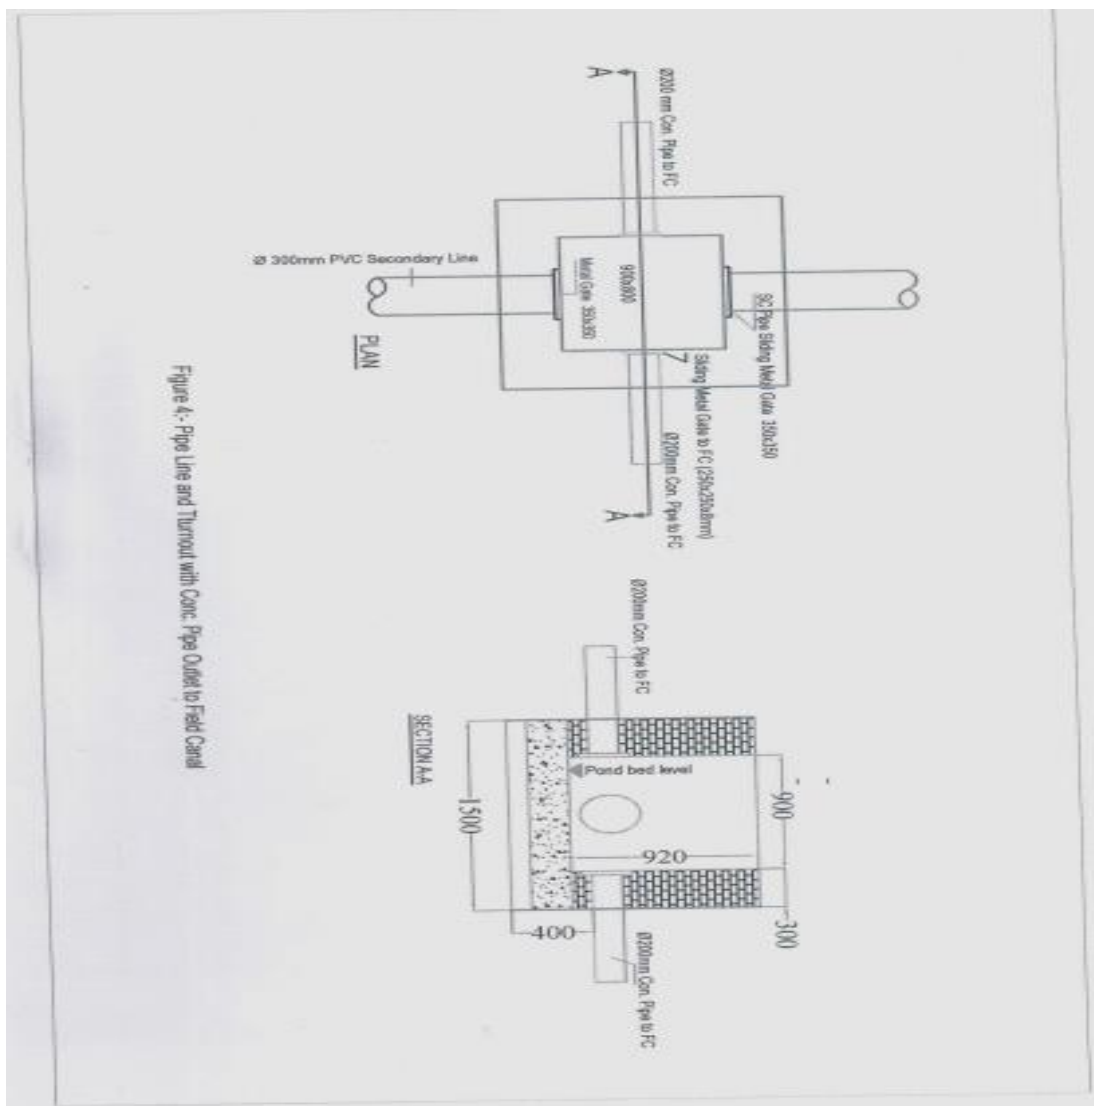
Pipe Line and Turnout with Conc. Pipe Outlet to Feed Canal
